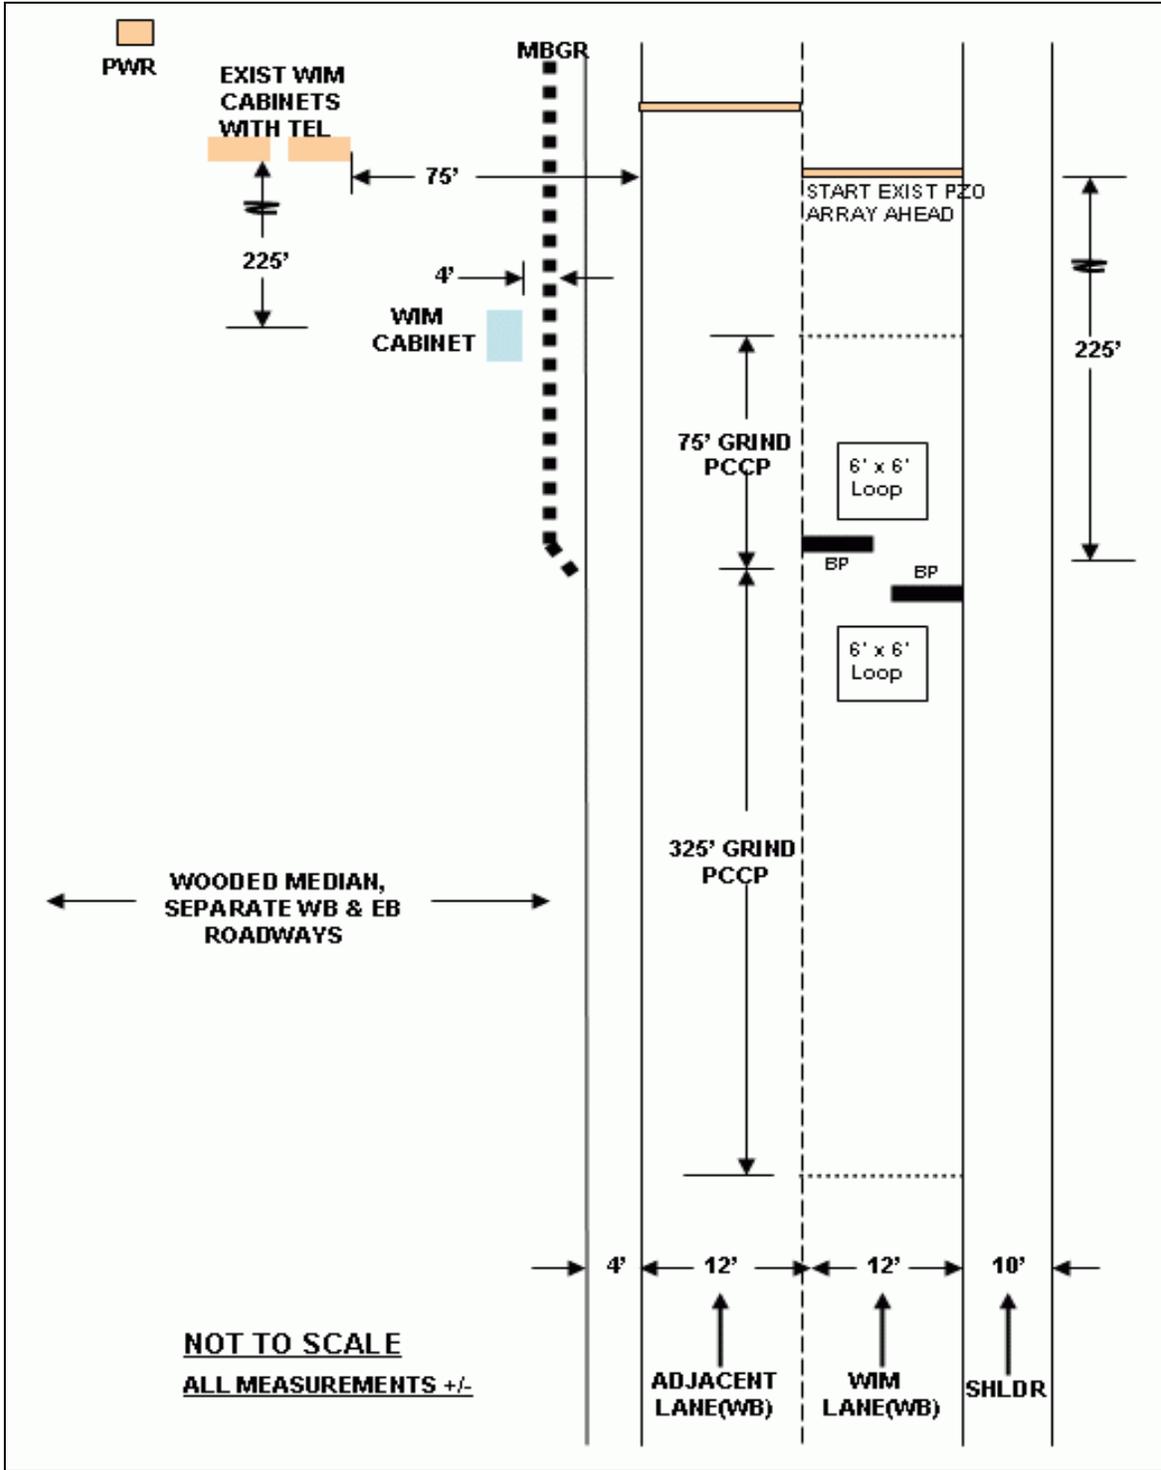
Proposed I-30 SPS-2 WIM Site Layout
